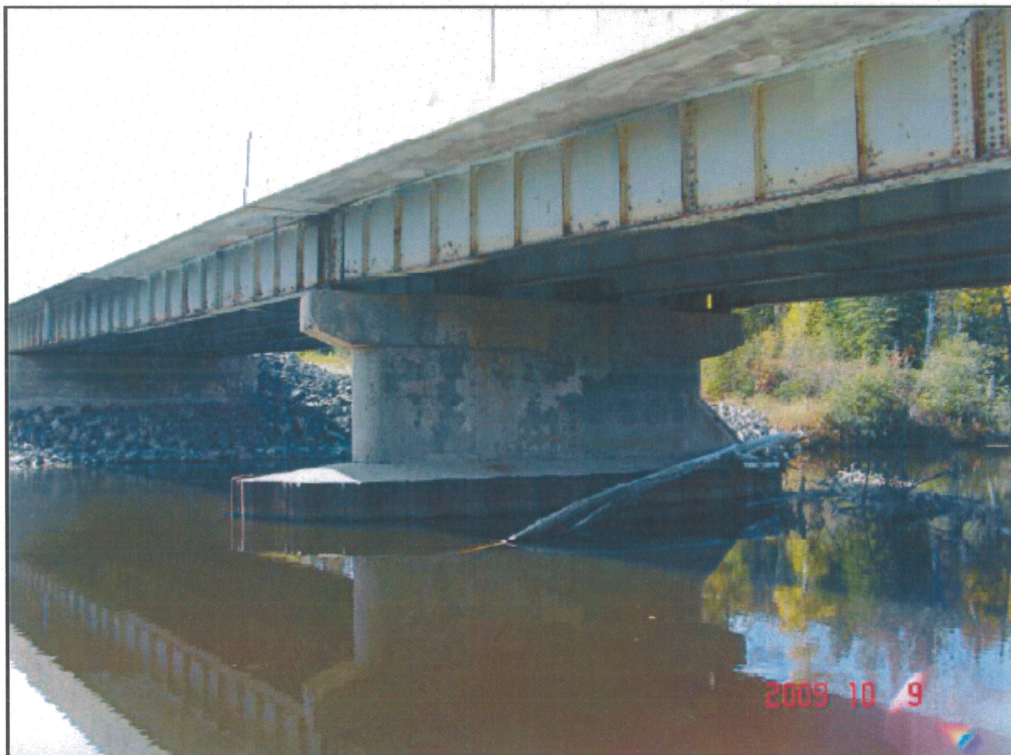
E – Highway 17 at Jackfish River bridge, looking west
